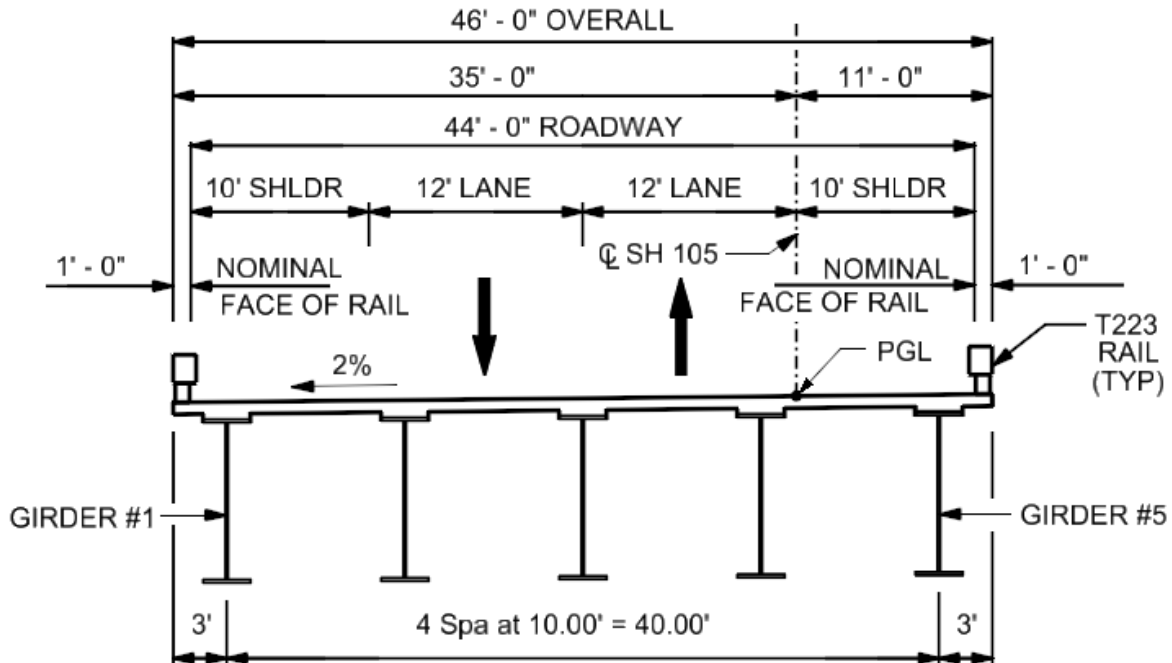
Typical Transverse Section on SH 105 Bridge
